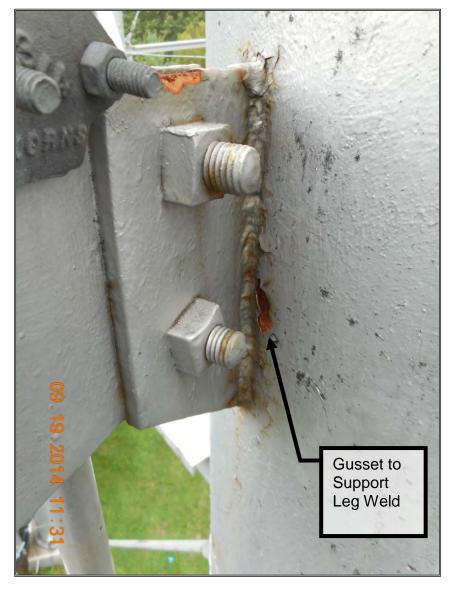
Surface Corrosion and Cracked Coating at Gusset to Support Leg Connections.
